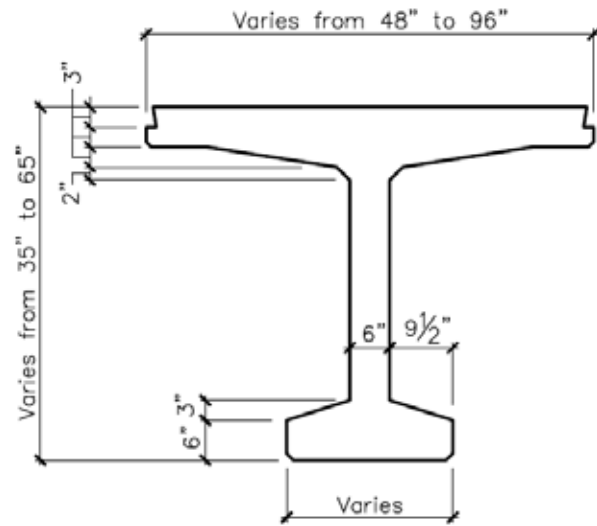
Typical decked bulb tee (DBT) cross section.
